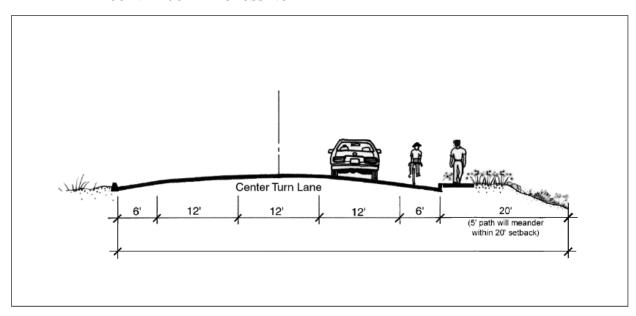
ORCUTT ROAD FROM HANSEN LANE TO TANK FARM ROAD (AFTER TERMINATION OF CENTER LANE ON ORCUTT ROAD)
